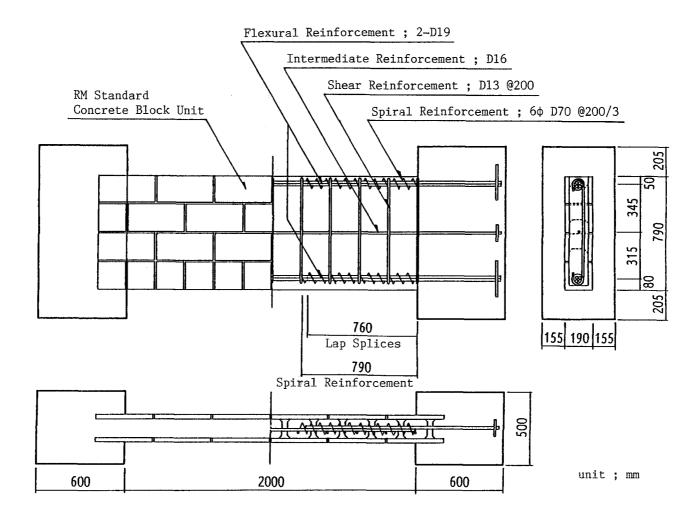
Dimensions of Wall Girder (GF4SL)
